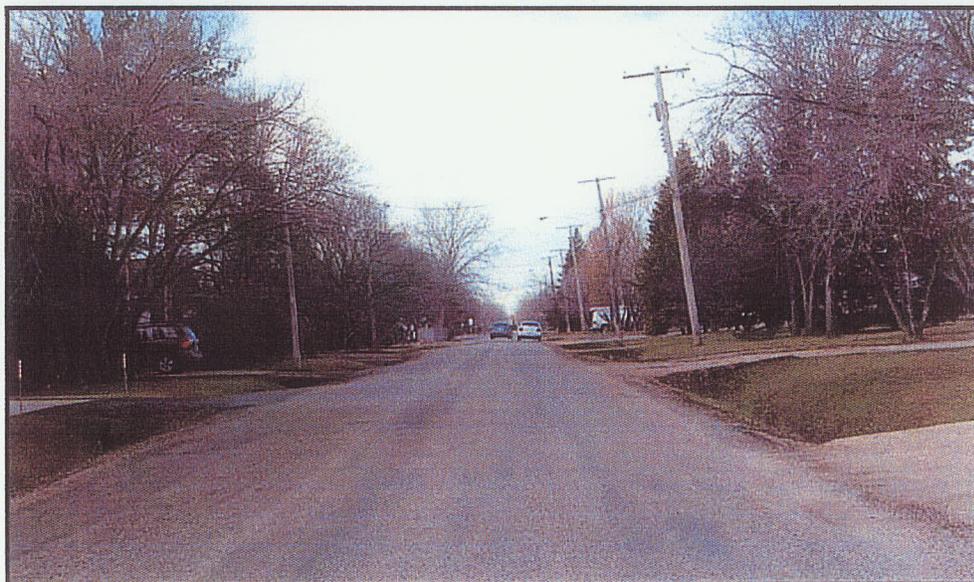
Typical Cross-Section of Roch Street, facing North
